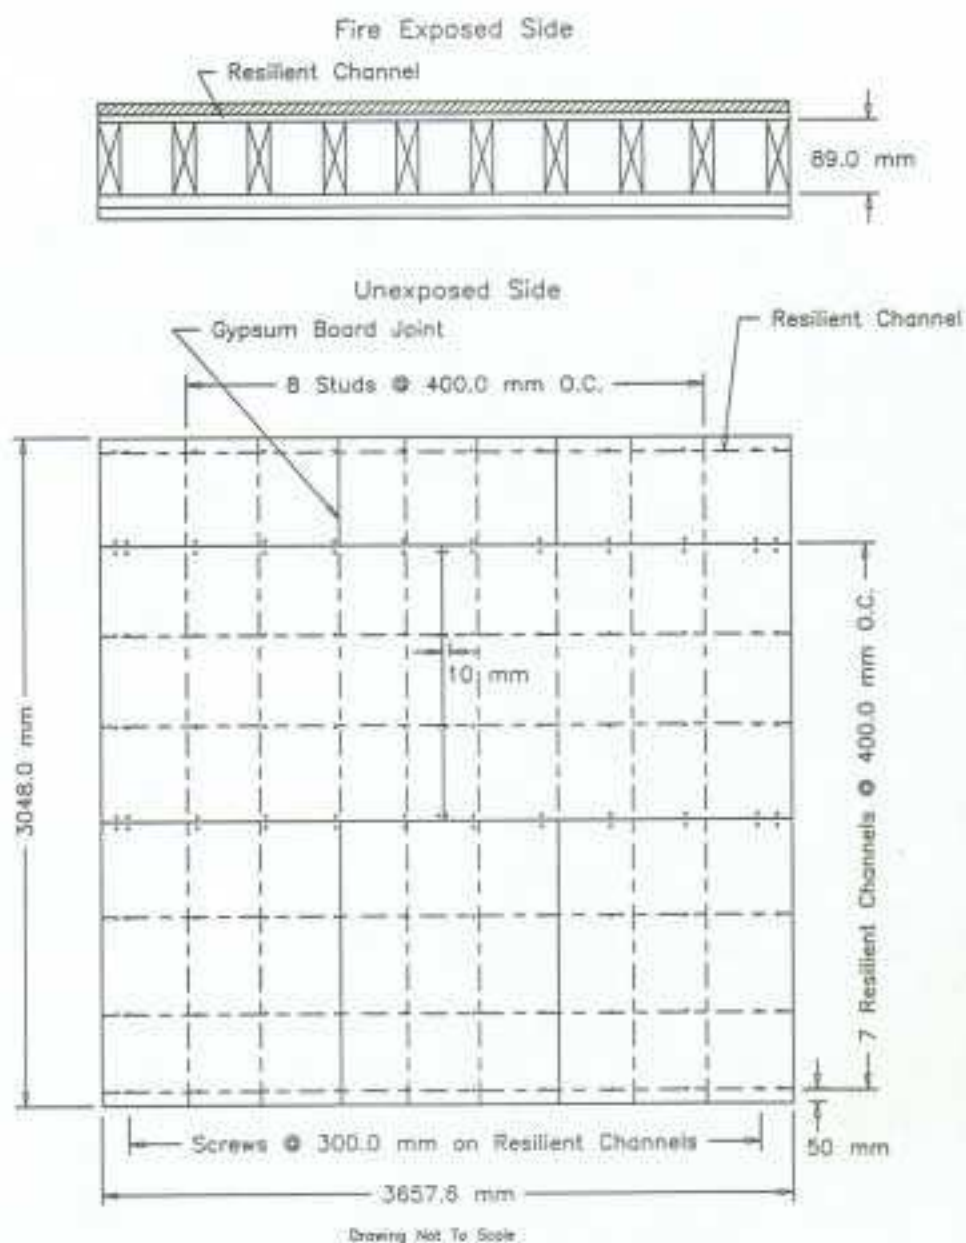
Screw Locations For Wood Stud, 1x2 Gypsum Board Layers, Full-Scale Assembly, Resilient Channel on Exposed Side (Base Layer Exposed Side)
